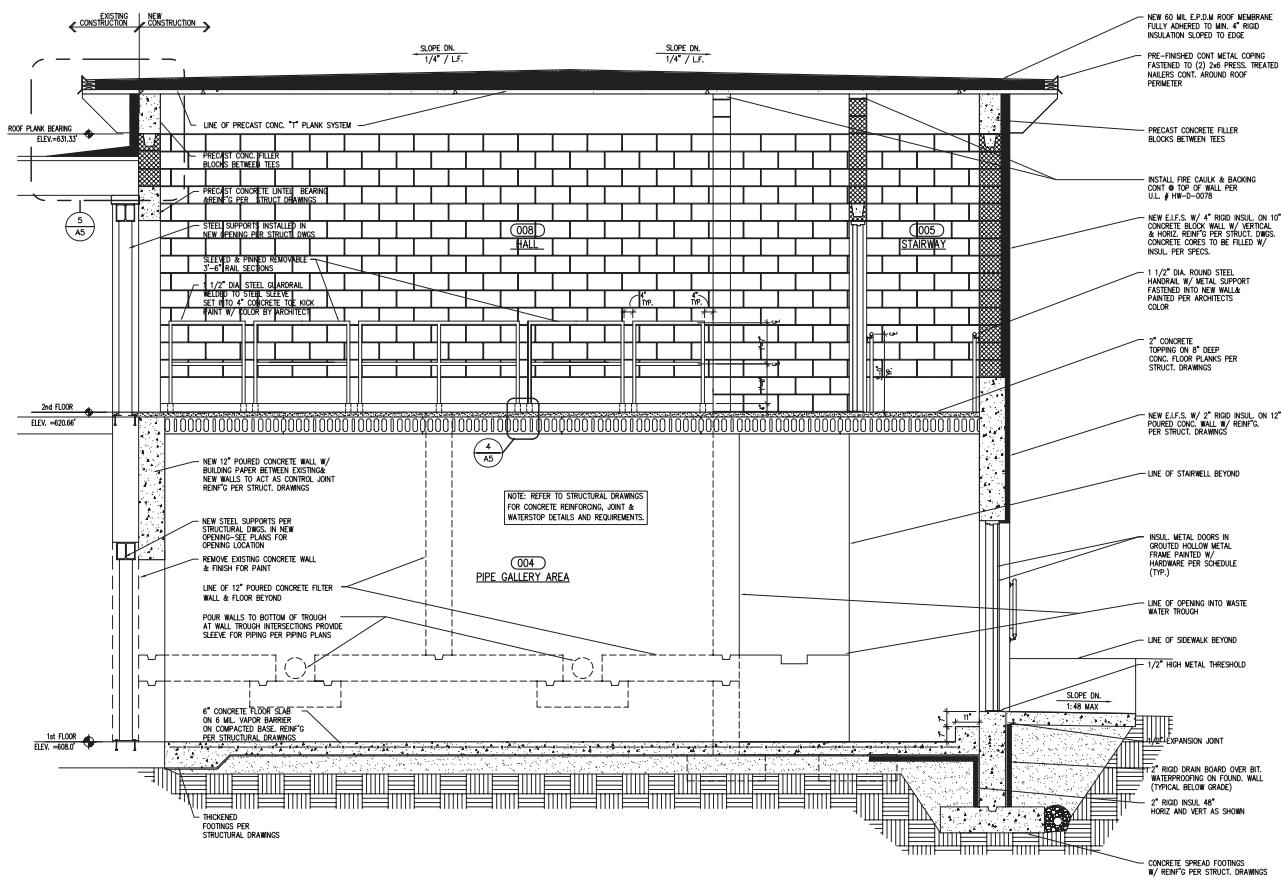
shows a general section for the Baraga water treatment facility upgrade. This section shows the general building layout, clearly indicating where the pipe gallery is in relation to the hall above it. Notice that not much detail and very few dimensions are provided in this section; however, the drawing is helpful in understanding the overall design of the facility.
